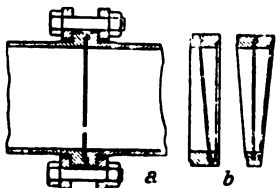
Detail of Joint Connection for Pipe Line of Water-Power Plant at Vauvry, Switzerland.
